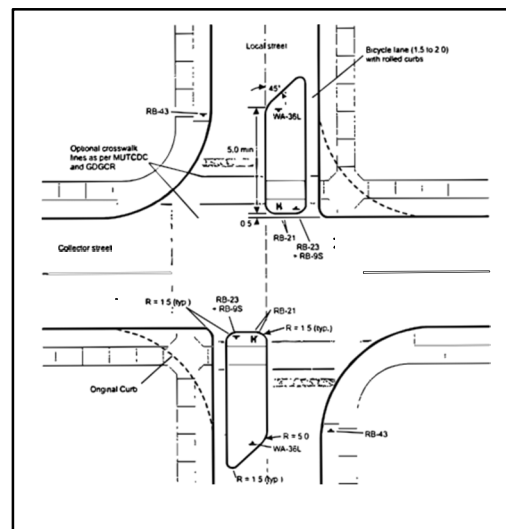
Half Street Closure, Both Sides of Intersection with Bicycle Access (Canadian)
